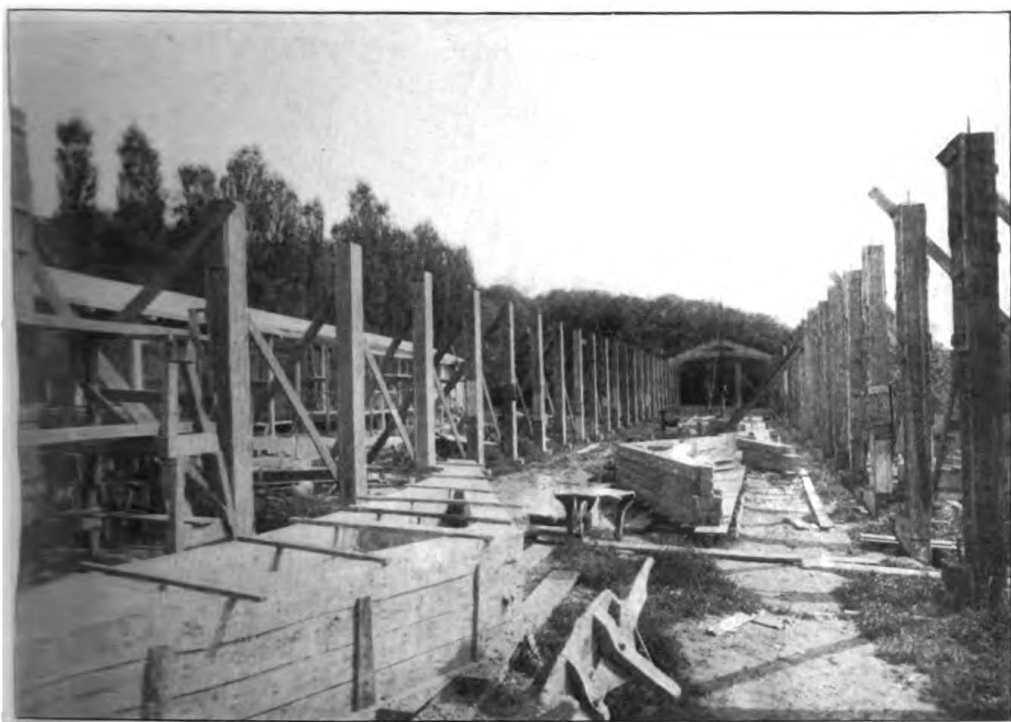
Construction of concrete ward. Pillars erected and arches cast.
